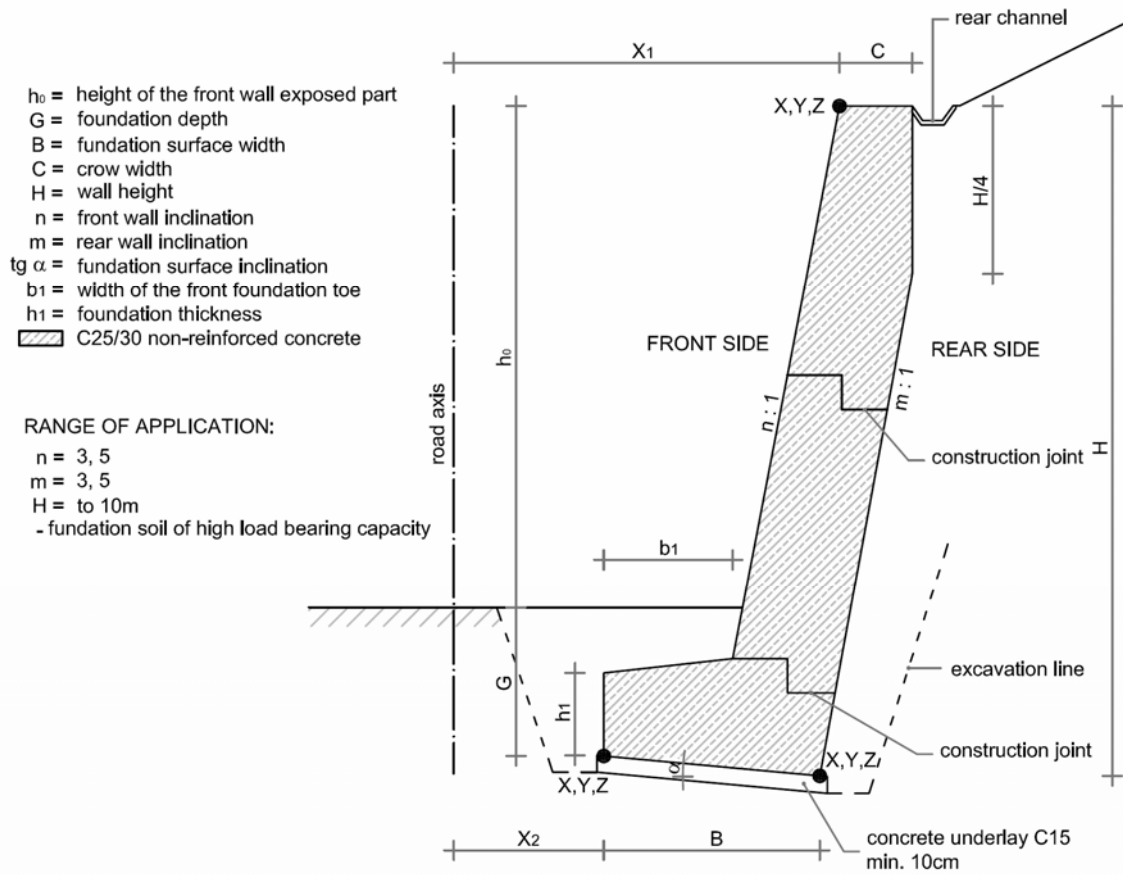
Concrete gravity retaining wall with an inclined rear wall, including staking out data
